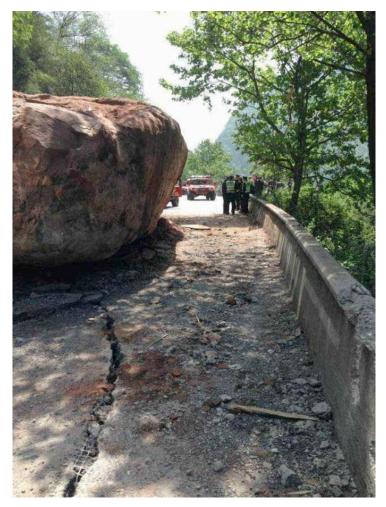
S210 damage on Feixianguan (飞仙关) Road by large boulders
